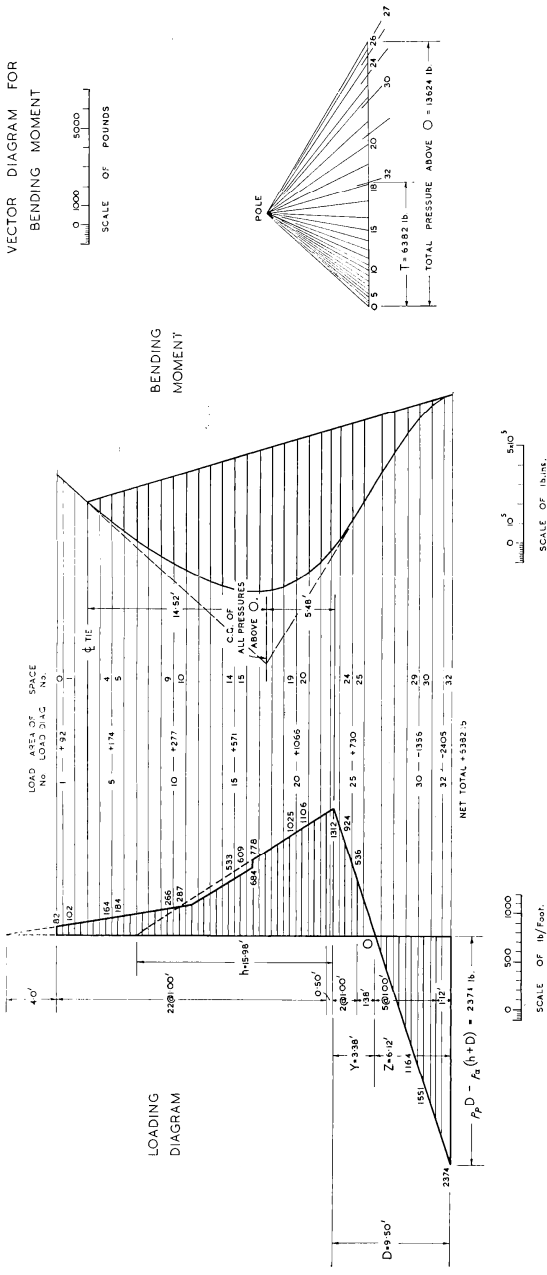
ANCHORED STEEL SHEET WALL WITH MINIMUM PENETRATION.
